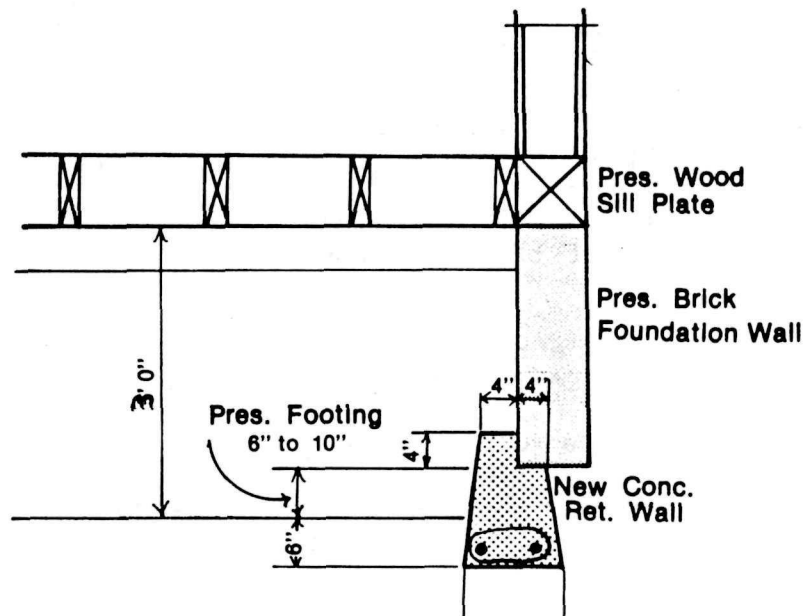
Lincoln Home, Specifications for Concrete Retaining Wall Located Beneath 19th Century Brick Wall (Courtesy of the National Park Service).
